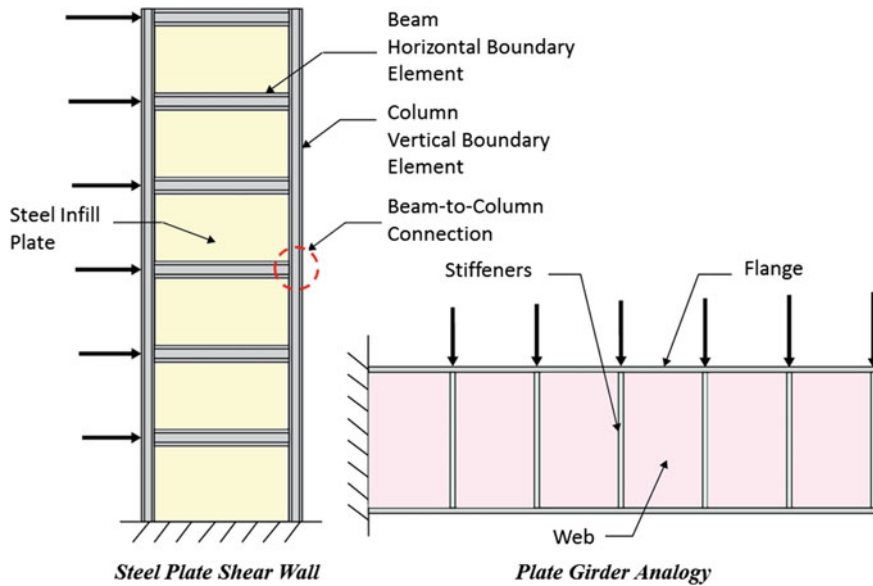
Analogous relationship of the steel plate shear wall and the plate girder
